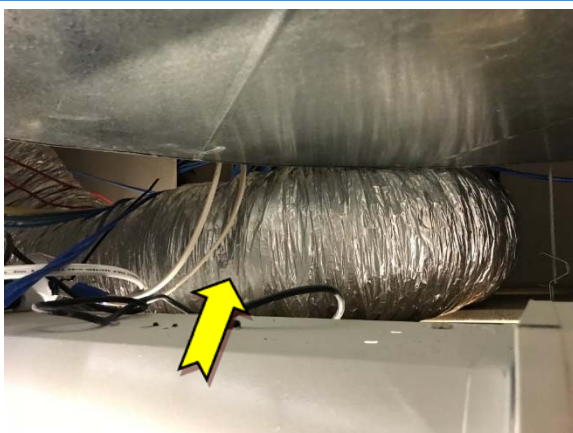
Interior, level 3, throughout, ceiling – suspected SMF compressed ceiling tiles.
